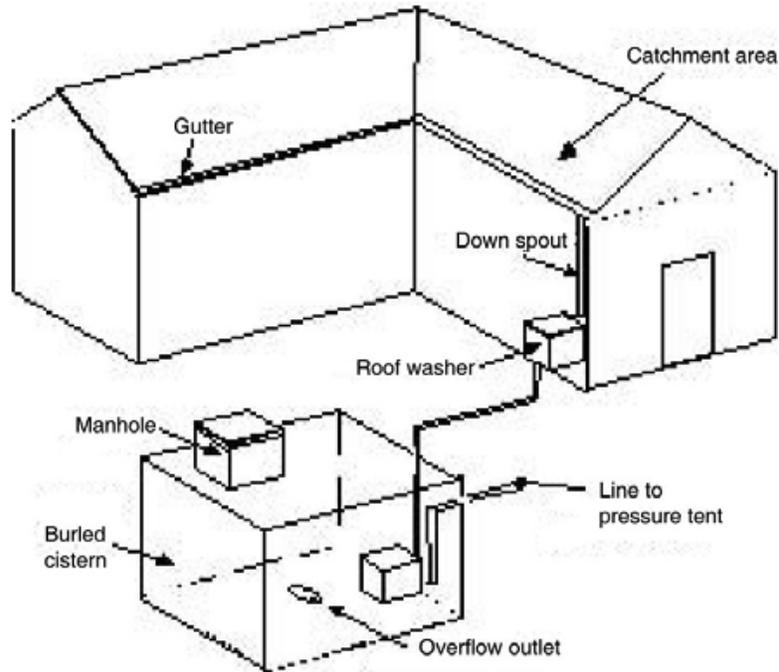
Typical roof water harvesting system in Jordan (Source: from Abdulla & Al-Shareef, 2009, P. 199)
